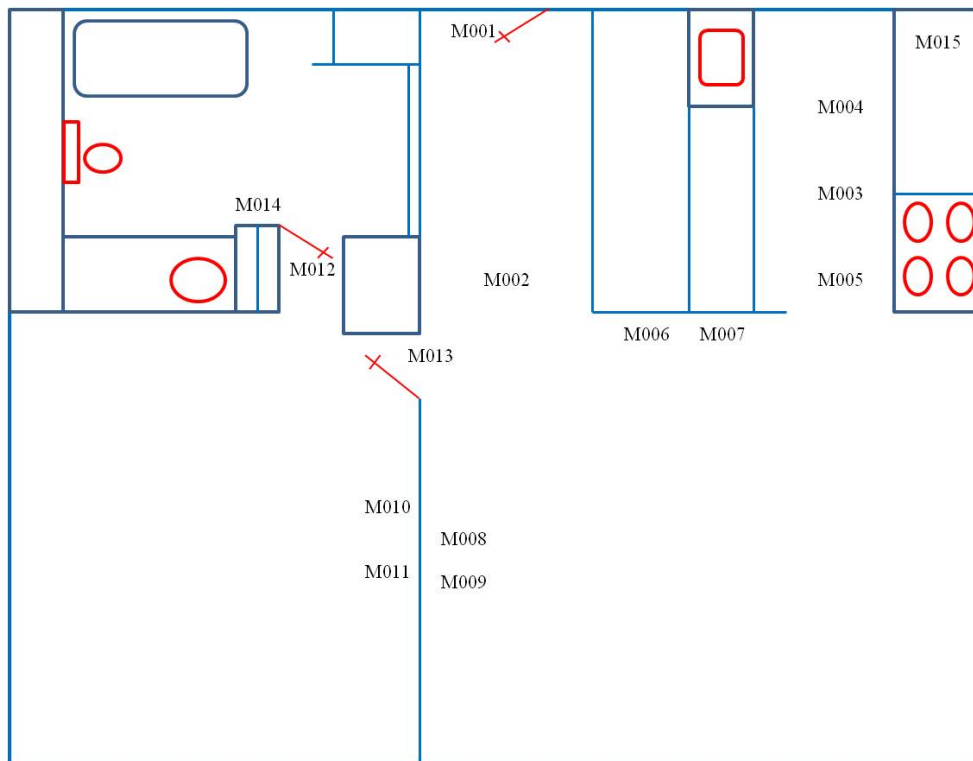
Floor plan and sensor placement for the testbed hh126.
